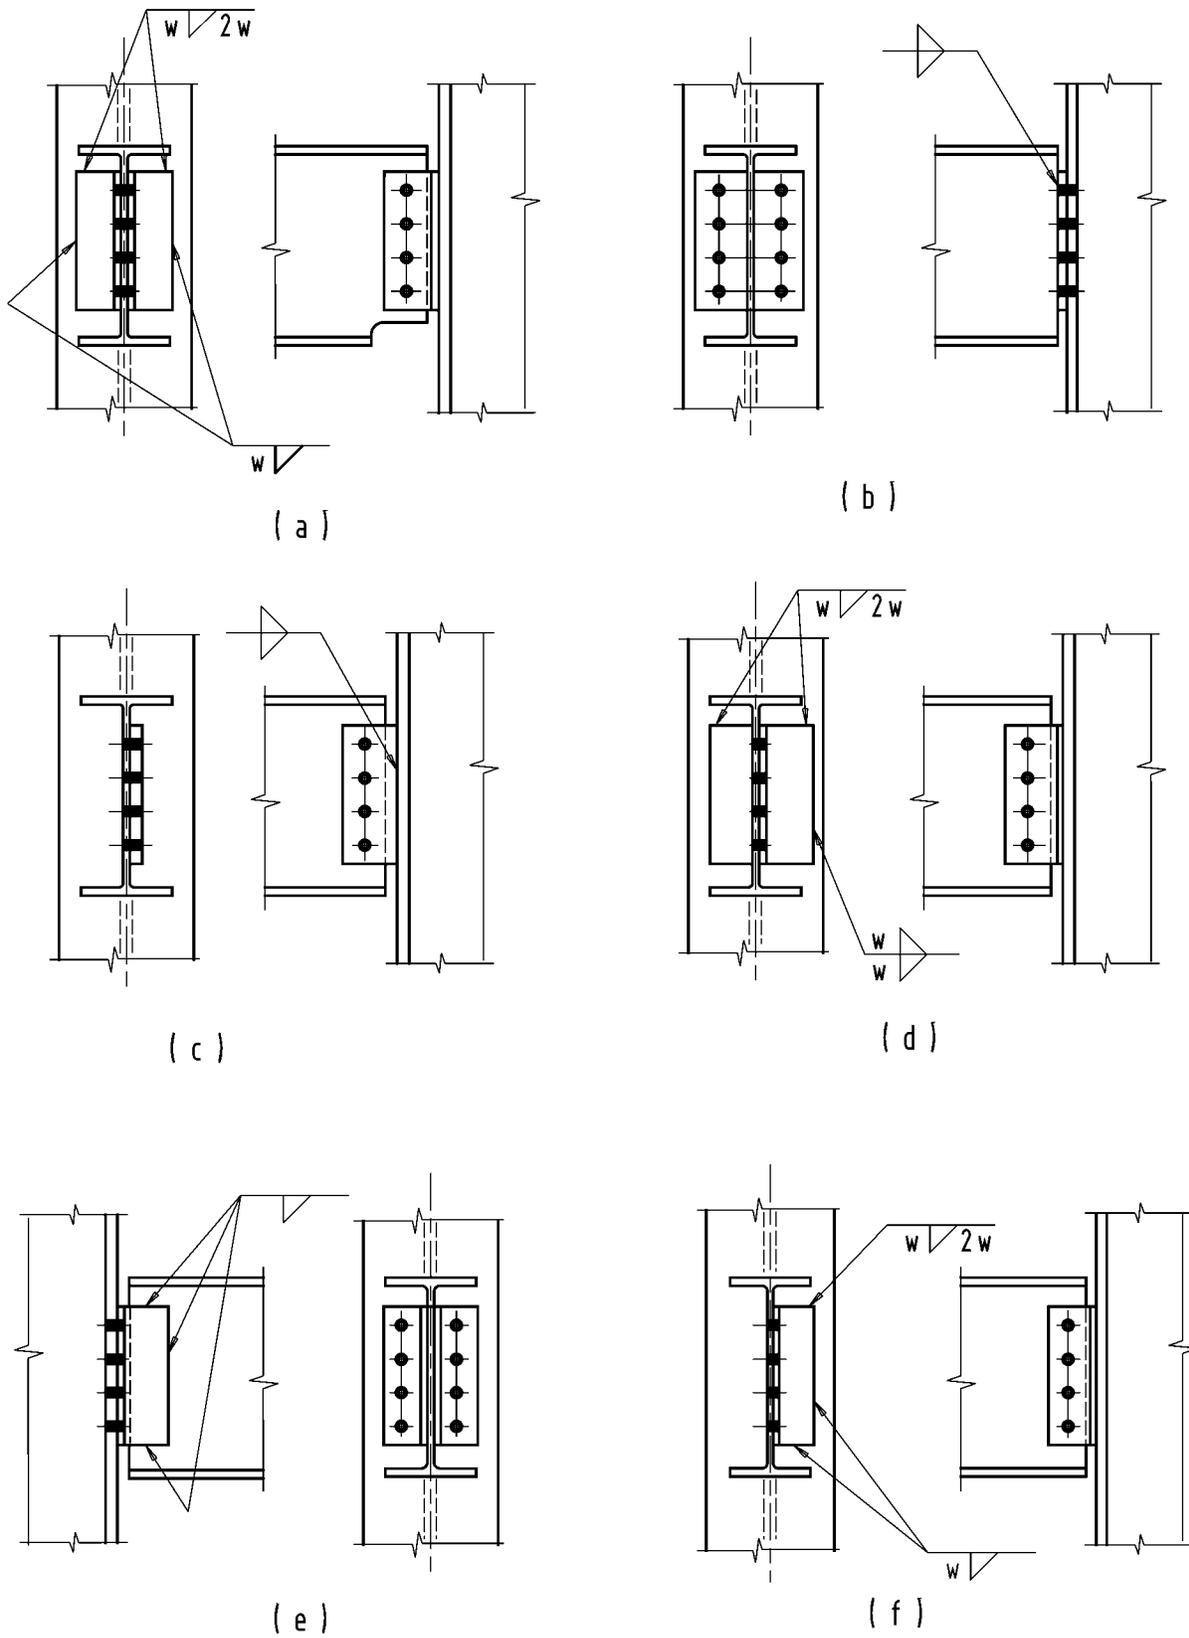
Shop-welded, field-bolted beam connections suitable for shop-welded, field-bolted construction.
